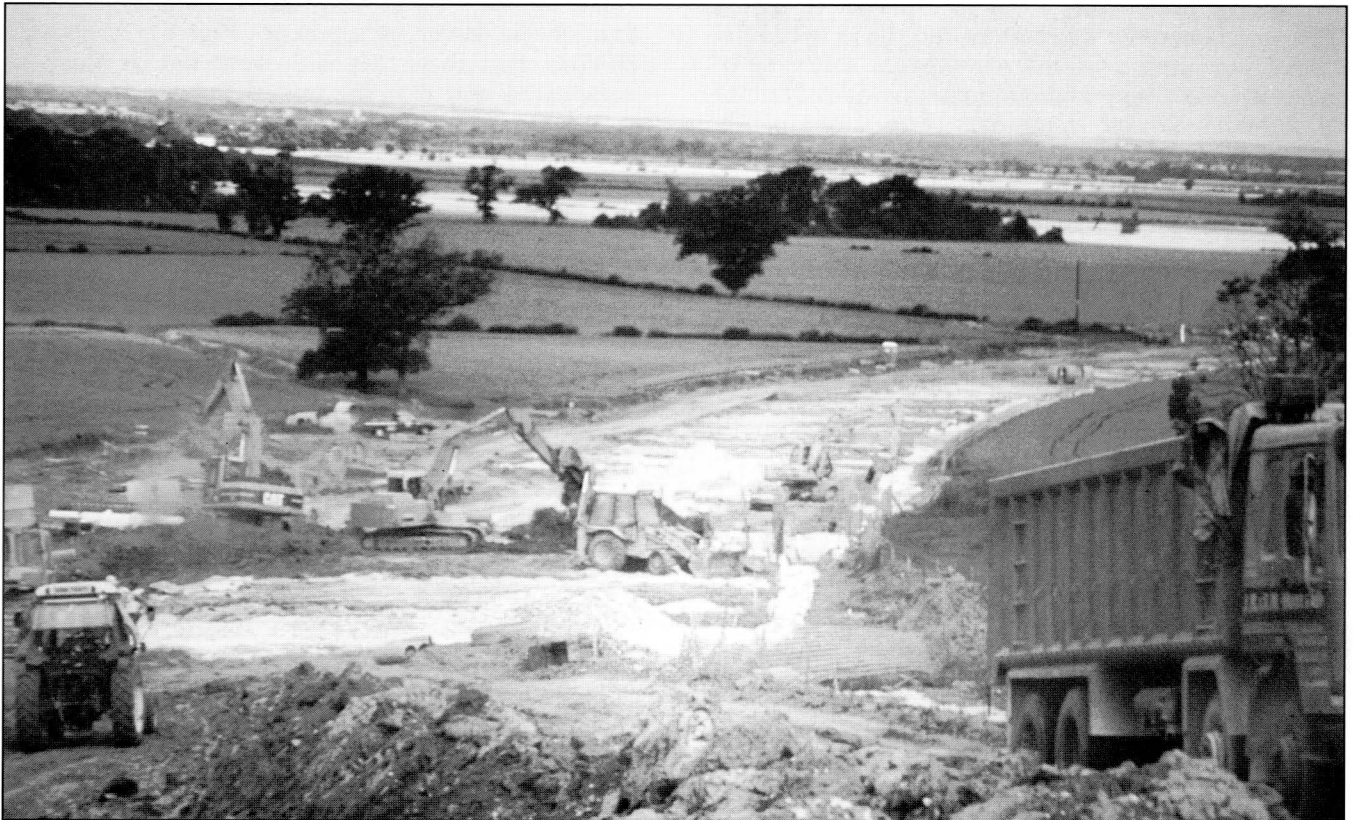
Installation of the drainage system to de-water head deposits before construction of the embankment.
